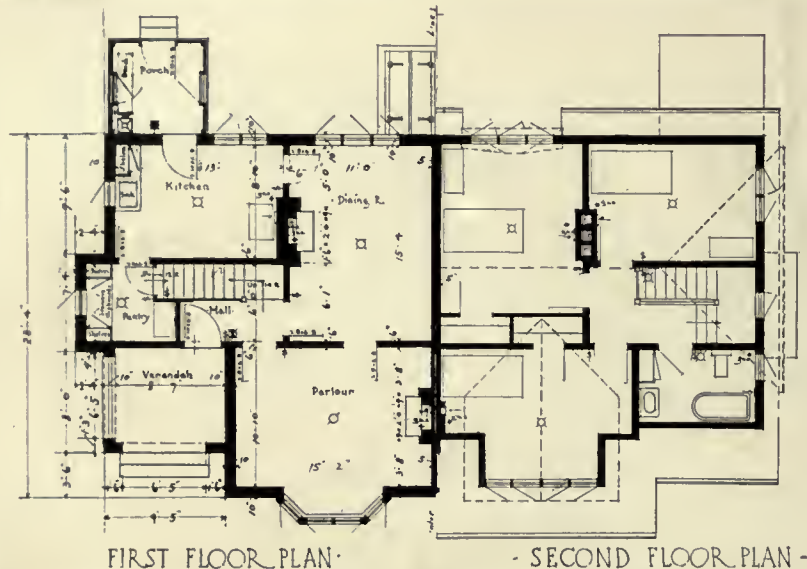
Floor Plans of Double Houses 5-6 and 14-15
